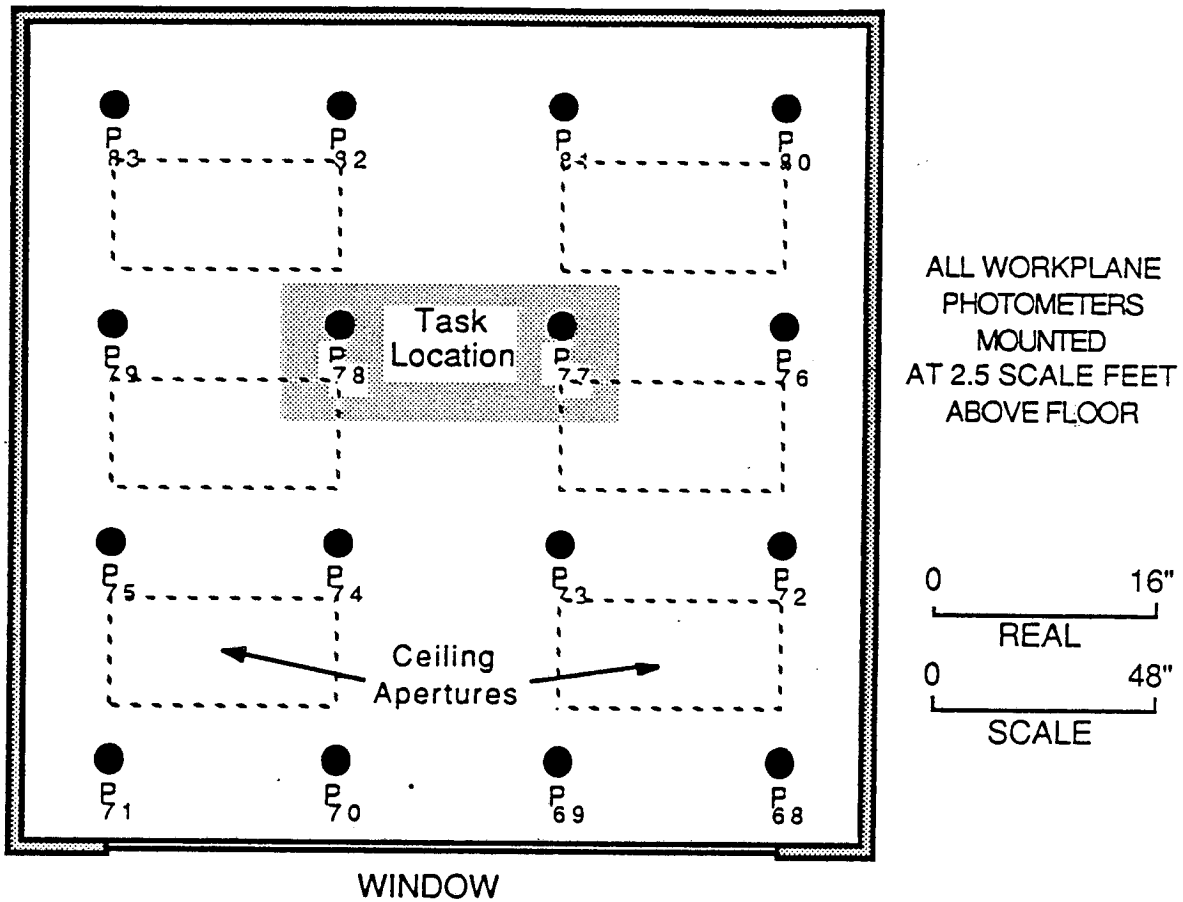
Floor plan and reflected ceiling diagram of small office model
